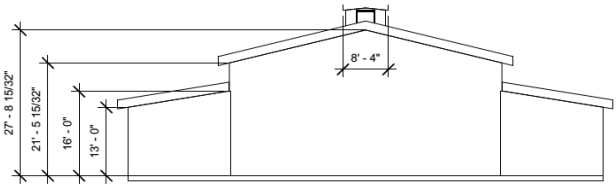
# EXHIBIT C: PROPOSED ARCHITECTURAL DRAWINGS (CONT'D)
